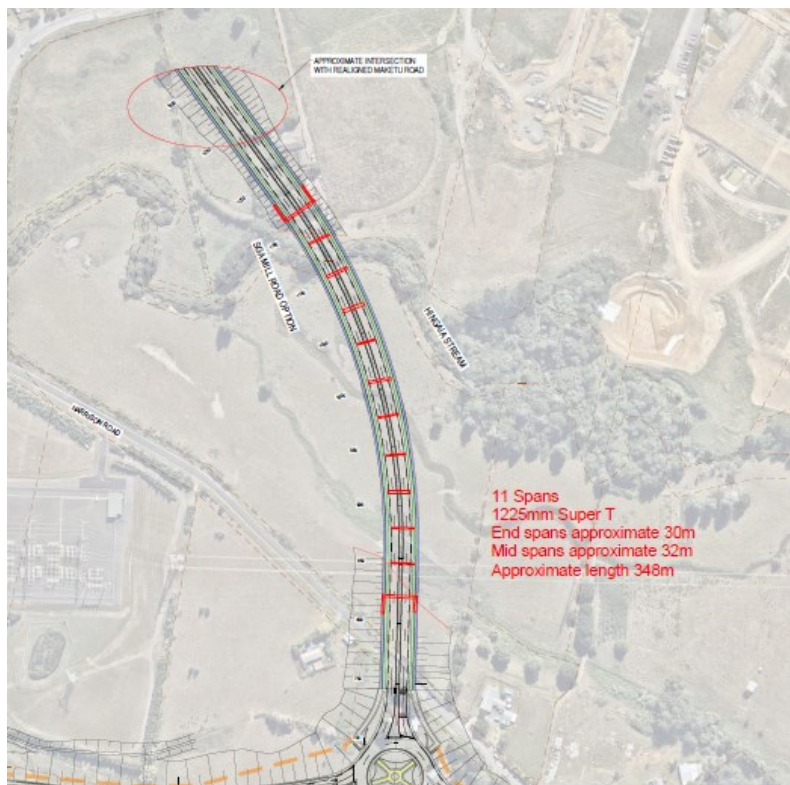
Drury South Interchange Connections Option B Southern Alignment Long Bridge
